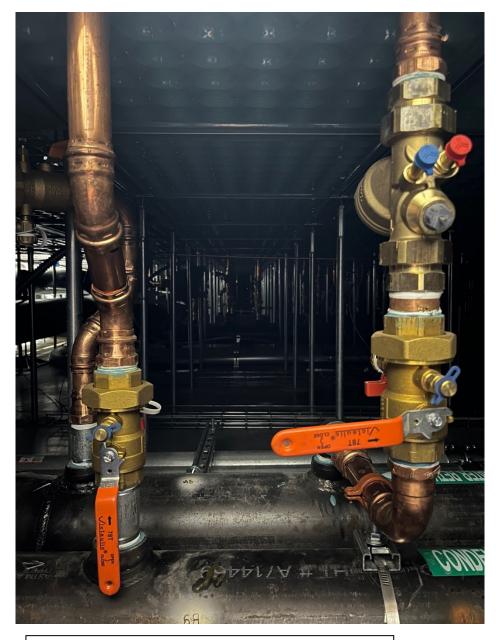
Example of cooling water circuit with inlet shut off valve open (on left), and outlet shut off valve in closed (on right)
